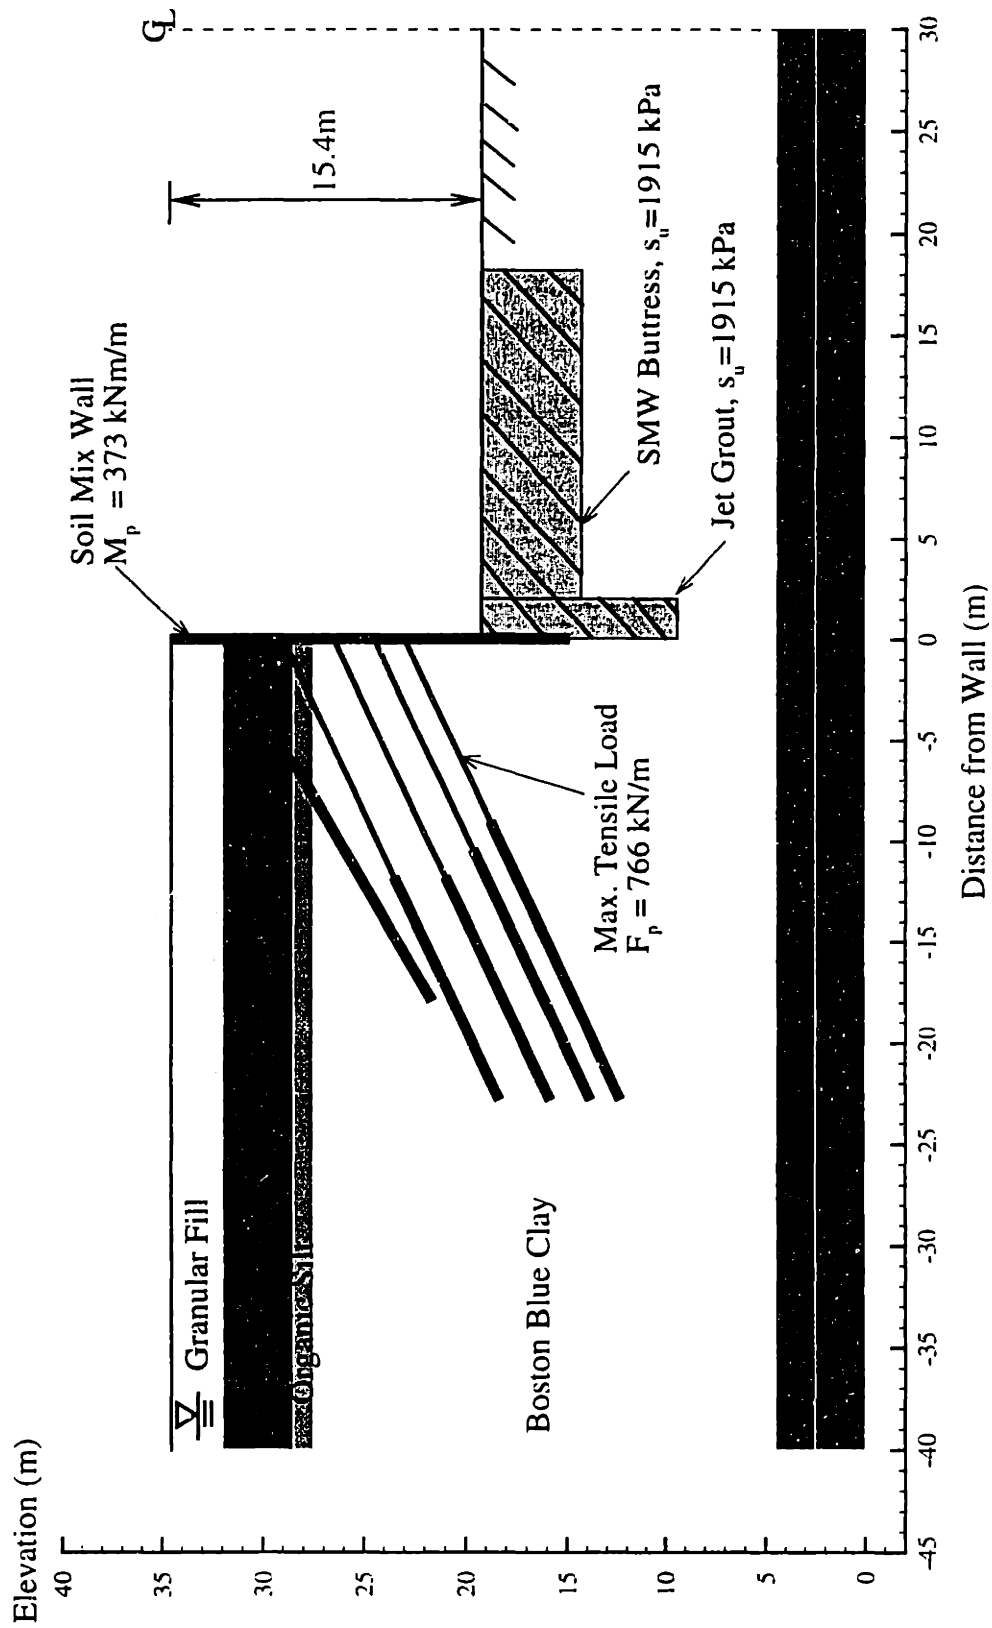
Cross section of West wall Section B-B': Remedial buttress
